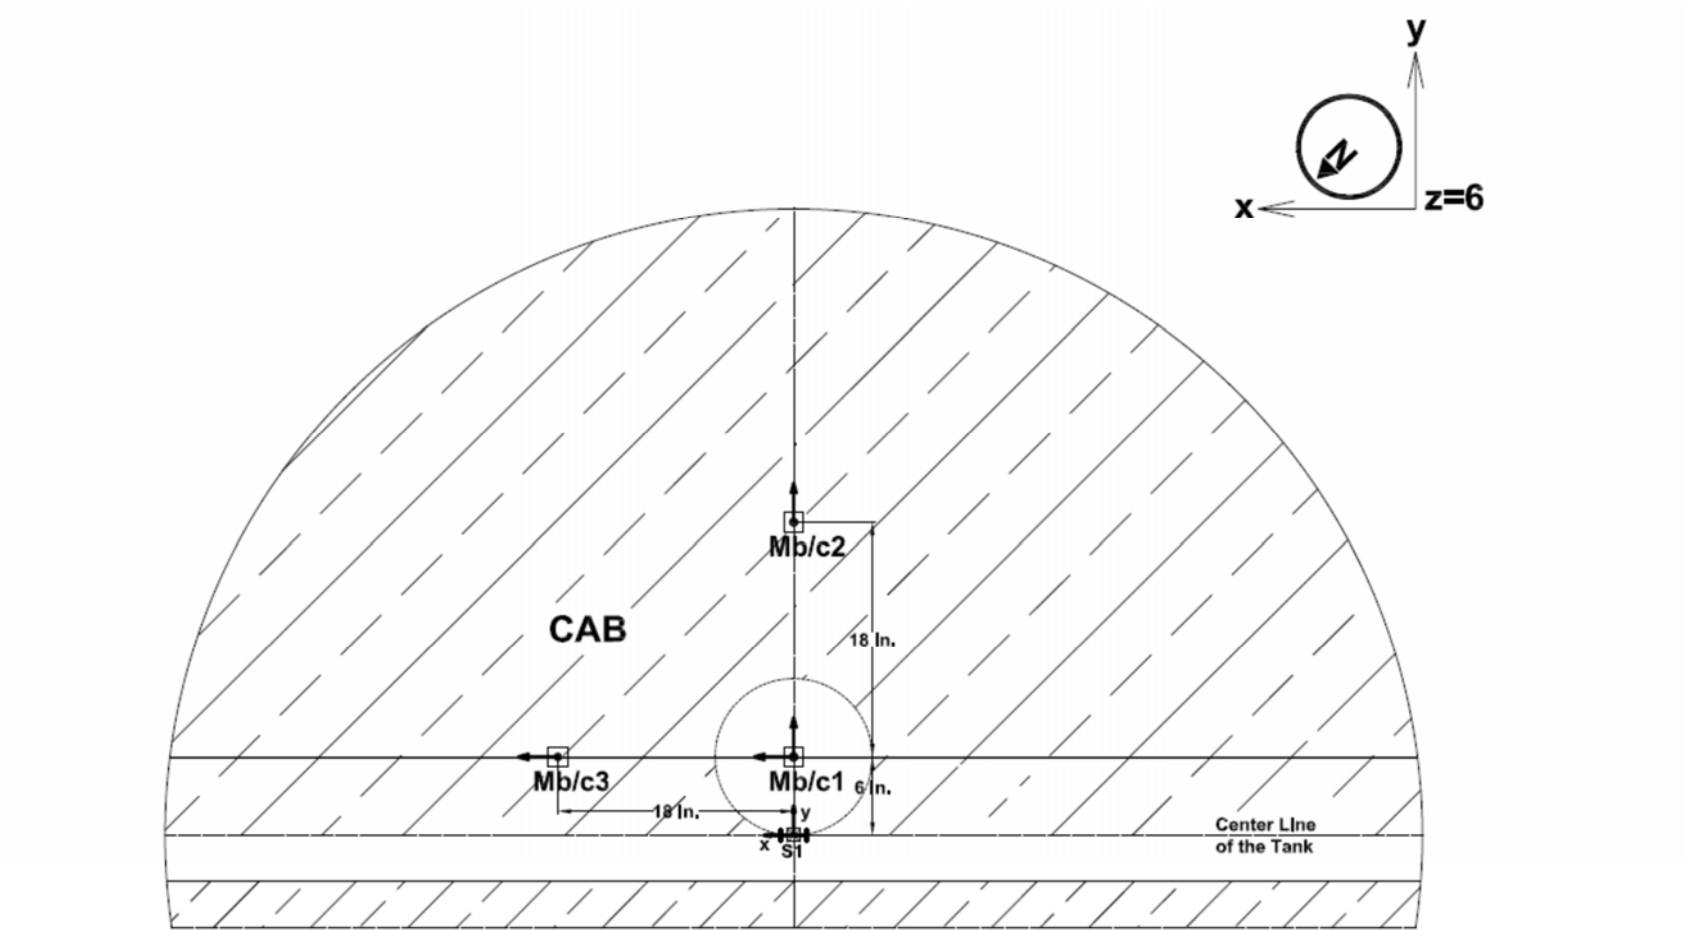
Instrumentation plan for experiment No. 10—Plan view, $Z=6$ inches
